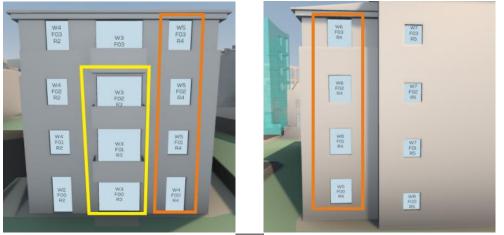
205 Arlington Road Window Map – North elevation (left), and Window Map – West elevation (right)
